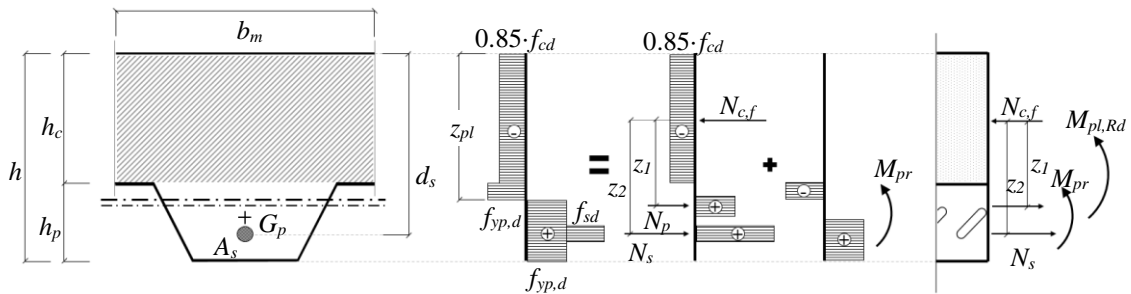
Sagging bending moment resistance (NA intersecting steel sheeting) – with longitudinal reinforcement
